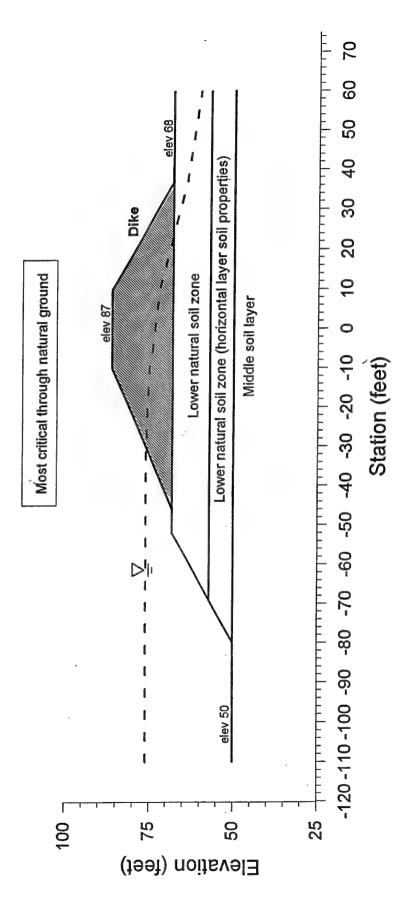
Section 1, as idealized, embankment on natural foundation deposit
